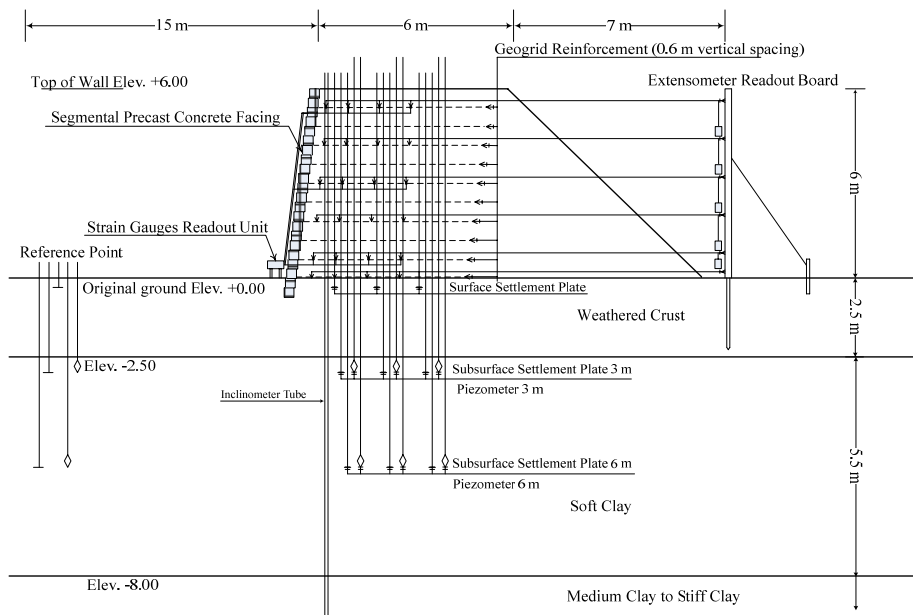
Section view of embankment with instrumentation construction of Full Scale Test Embankment
